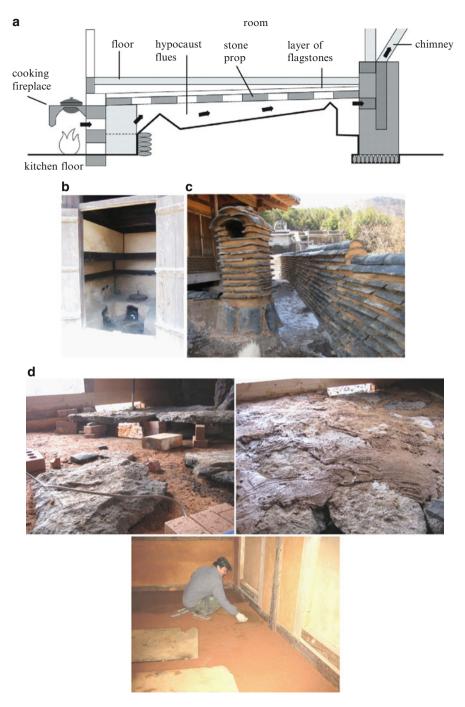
Fireplaces, traditional Korean Ondol fireplace (cooking area combined with floor heating system) [1]. (a) Cross section of system, floor with basement and hypocaust heating system. (b) Cooking area outside the house. (c) Separate chimney. (d) Installation of "supported" flagstone floor followed by earth screed layer
